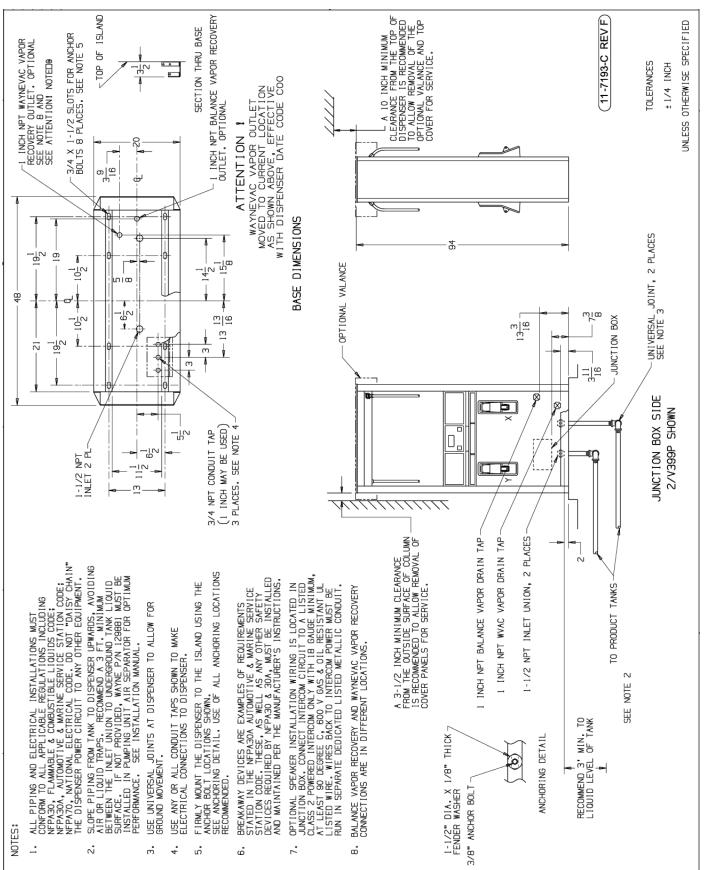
11-7193-C Installation Instructions - 4/V399P (Suction)
